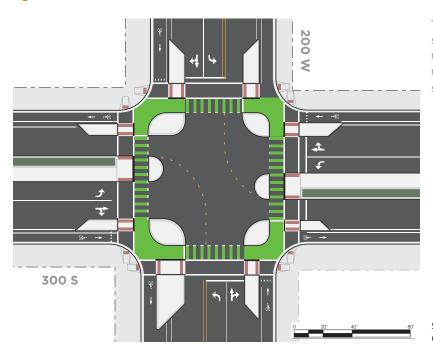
The Main Street - Extended Curb Intersection Approach.
